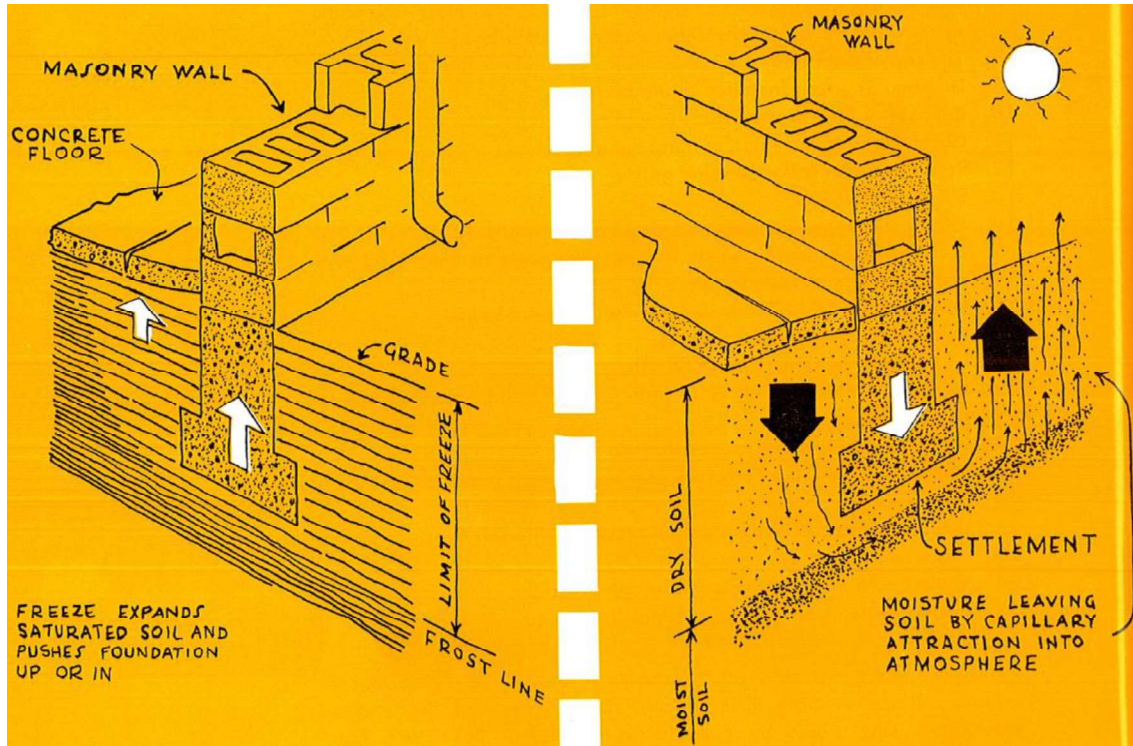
Cracks Caused by Shallow Foundation Failure illustration from PCS 1990.
